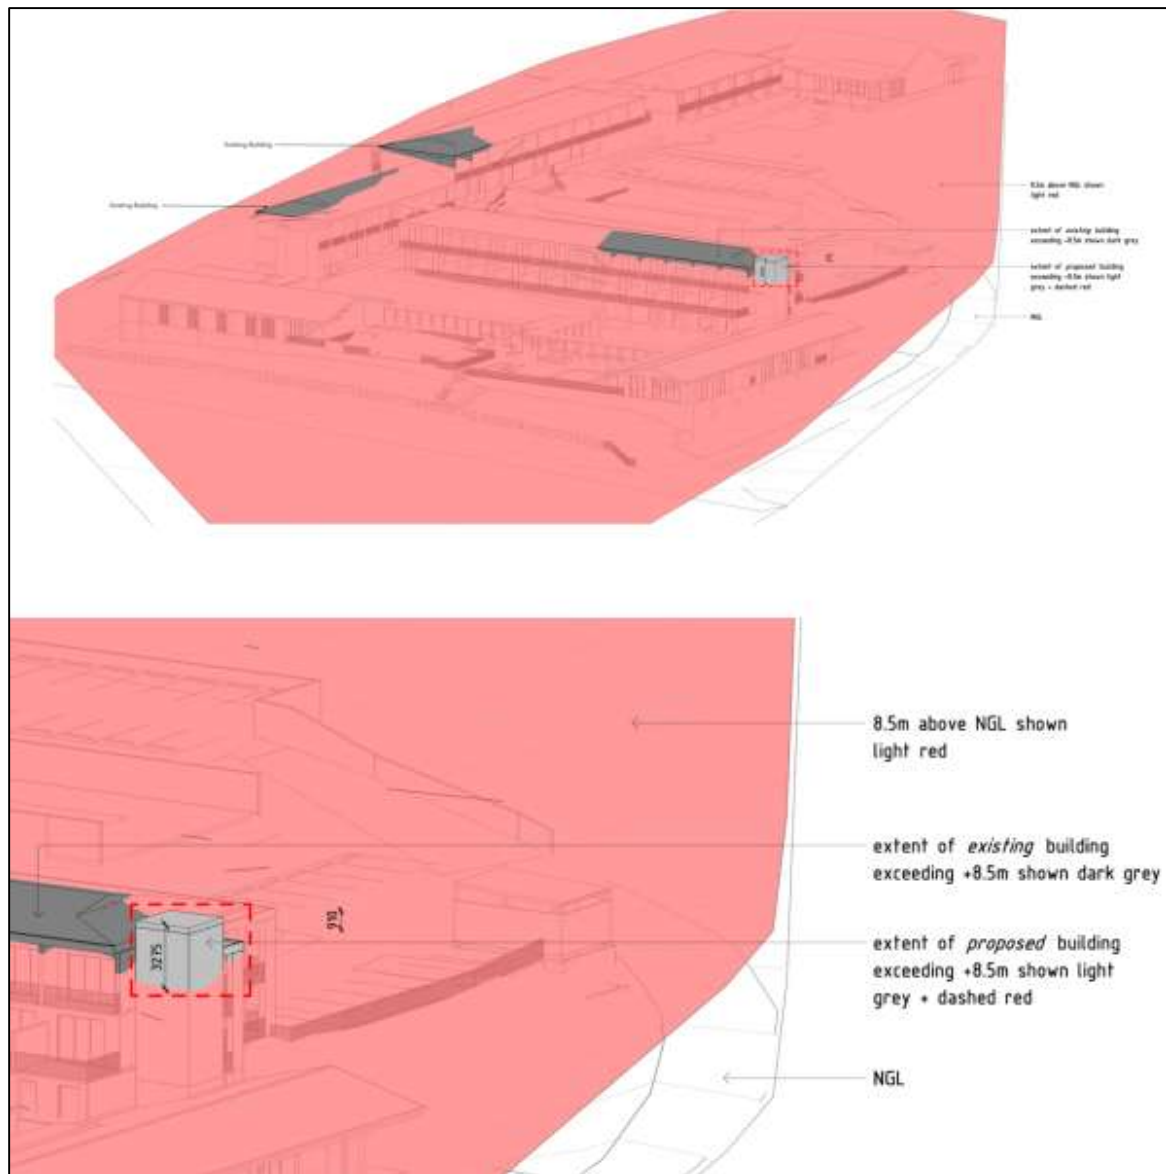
8.5m building height plane showing proposed building height breach of lift tower
